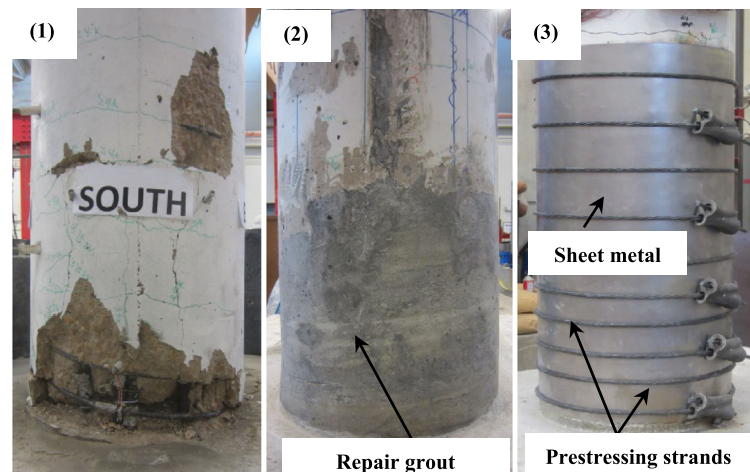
Details of the hybrid repair jacket: 1 damaged column, 2 original column cross section restored, 3 thin sheet metal wrapped around the column with prestressing strands placed over column.
